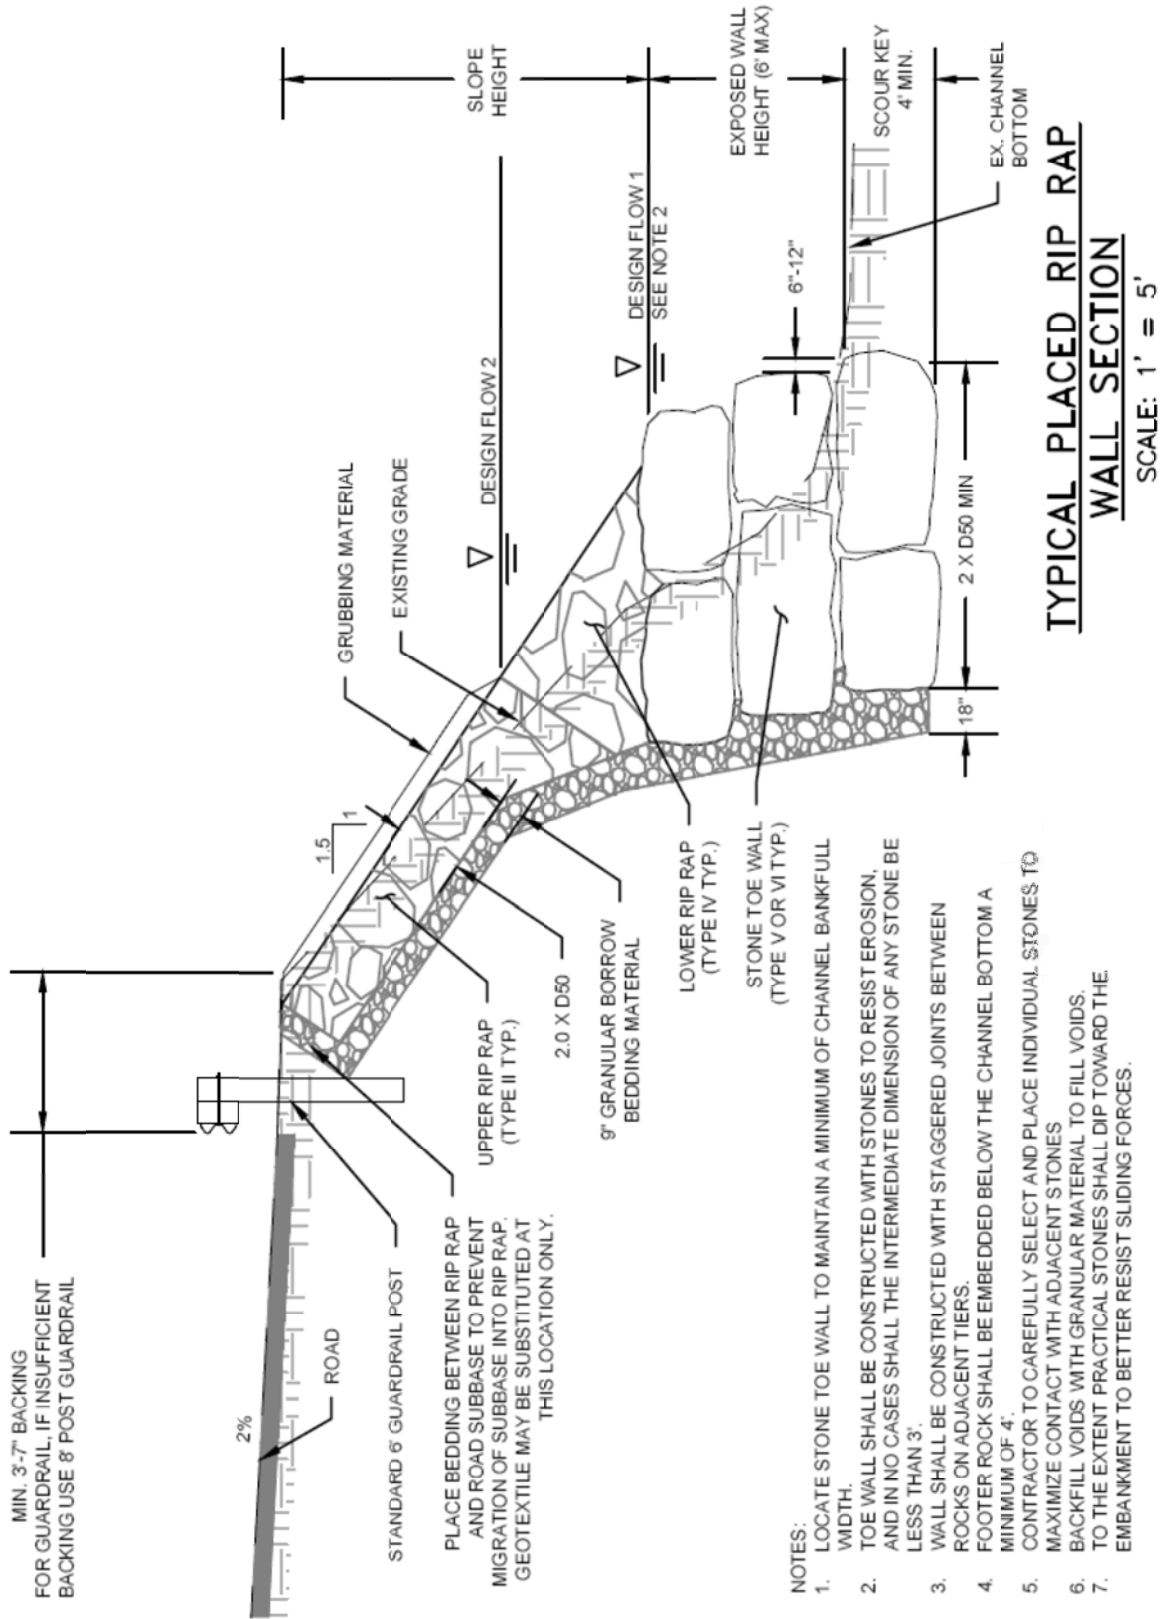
Placed riprap wall typical detail. (Source: Dubois & King and Milone & MacBroom, Inc., 5/1/2014)
